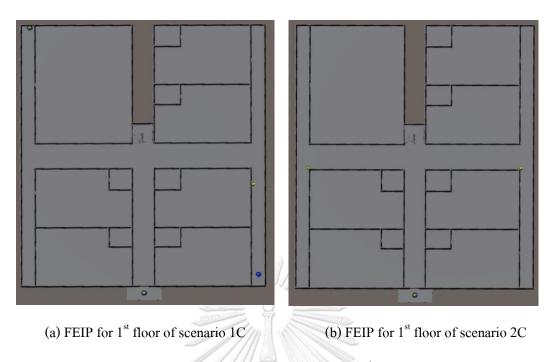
Fire extinguisher installation plan (FEIP) for 1st floor of two scenarios on sample building
